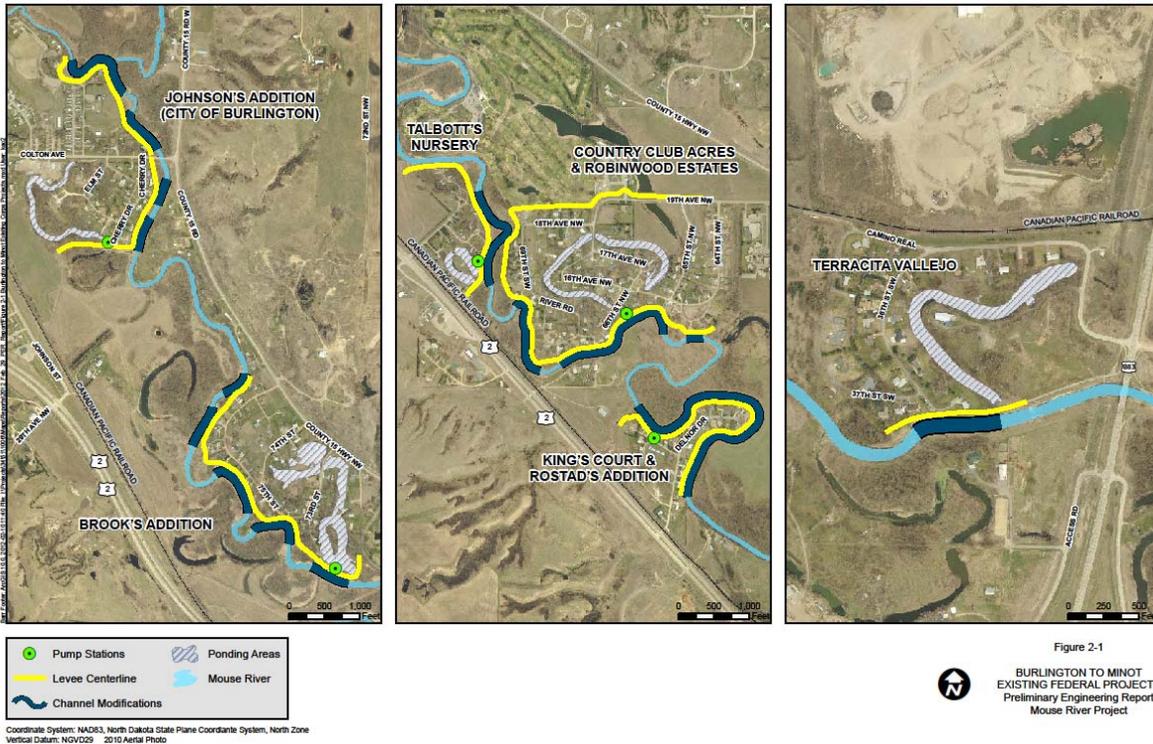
Layout of the existing authorized Flood Risk Management Projects (Burlington to Minot Subdivisions)
